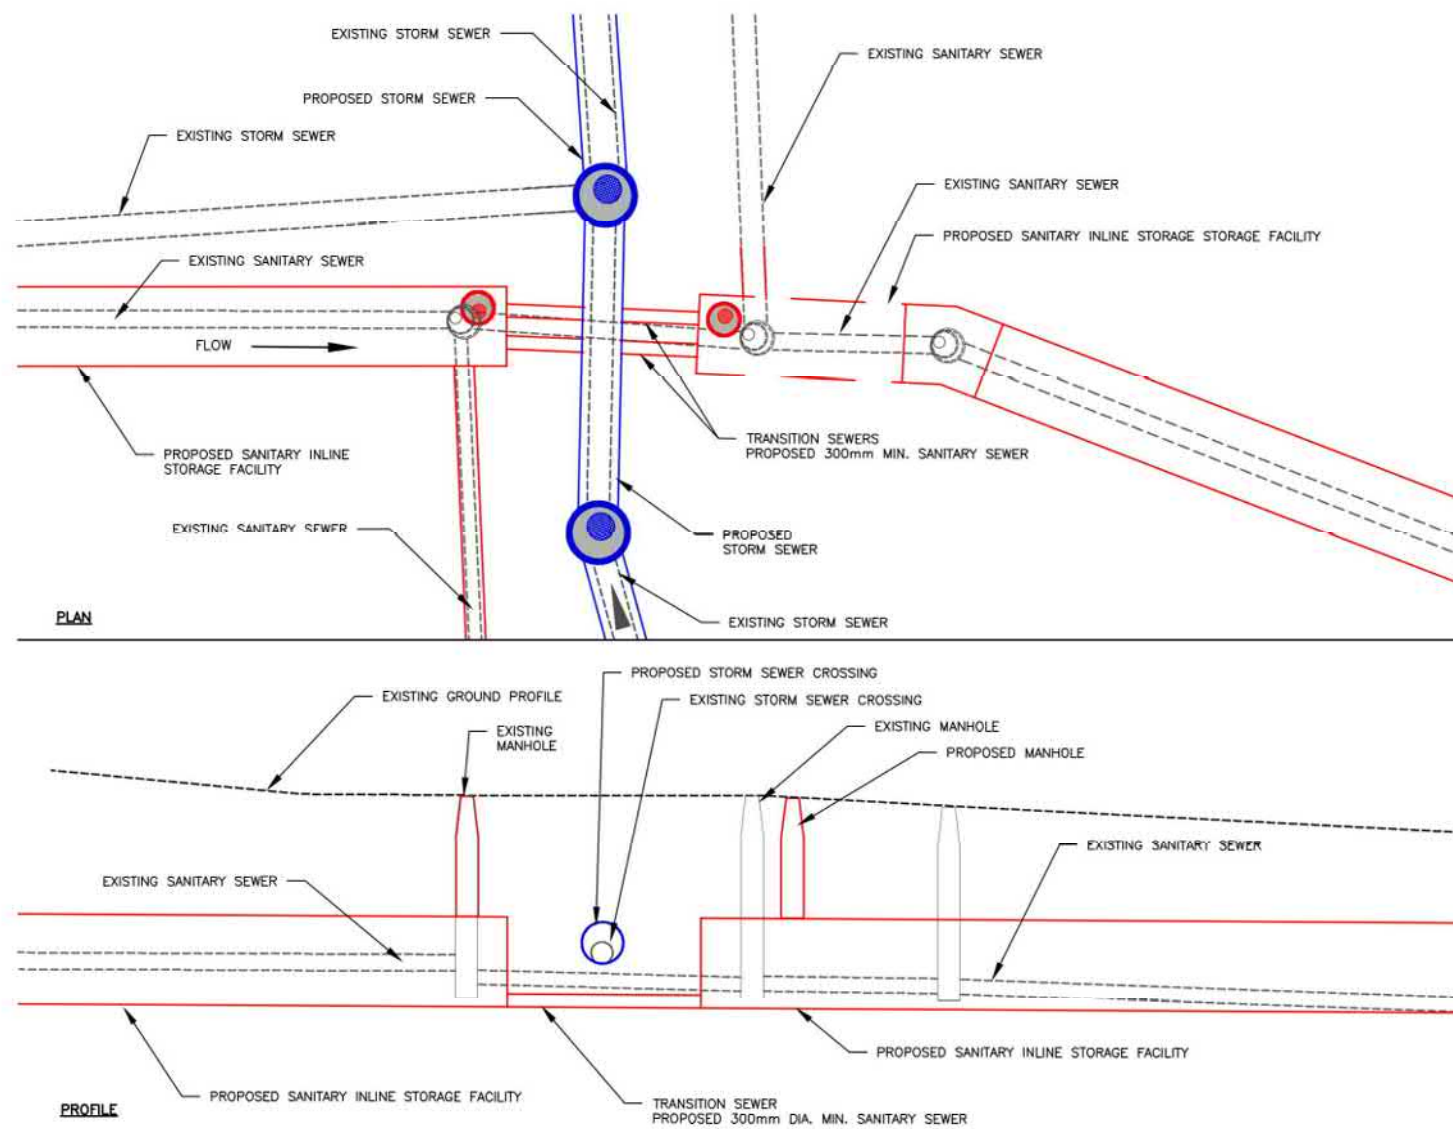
Outlet Control Sewer (Typical Detail #1)
